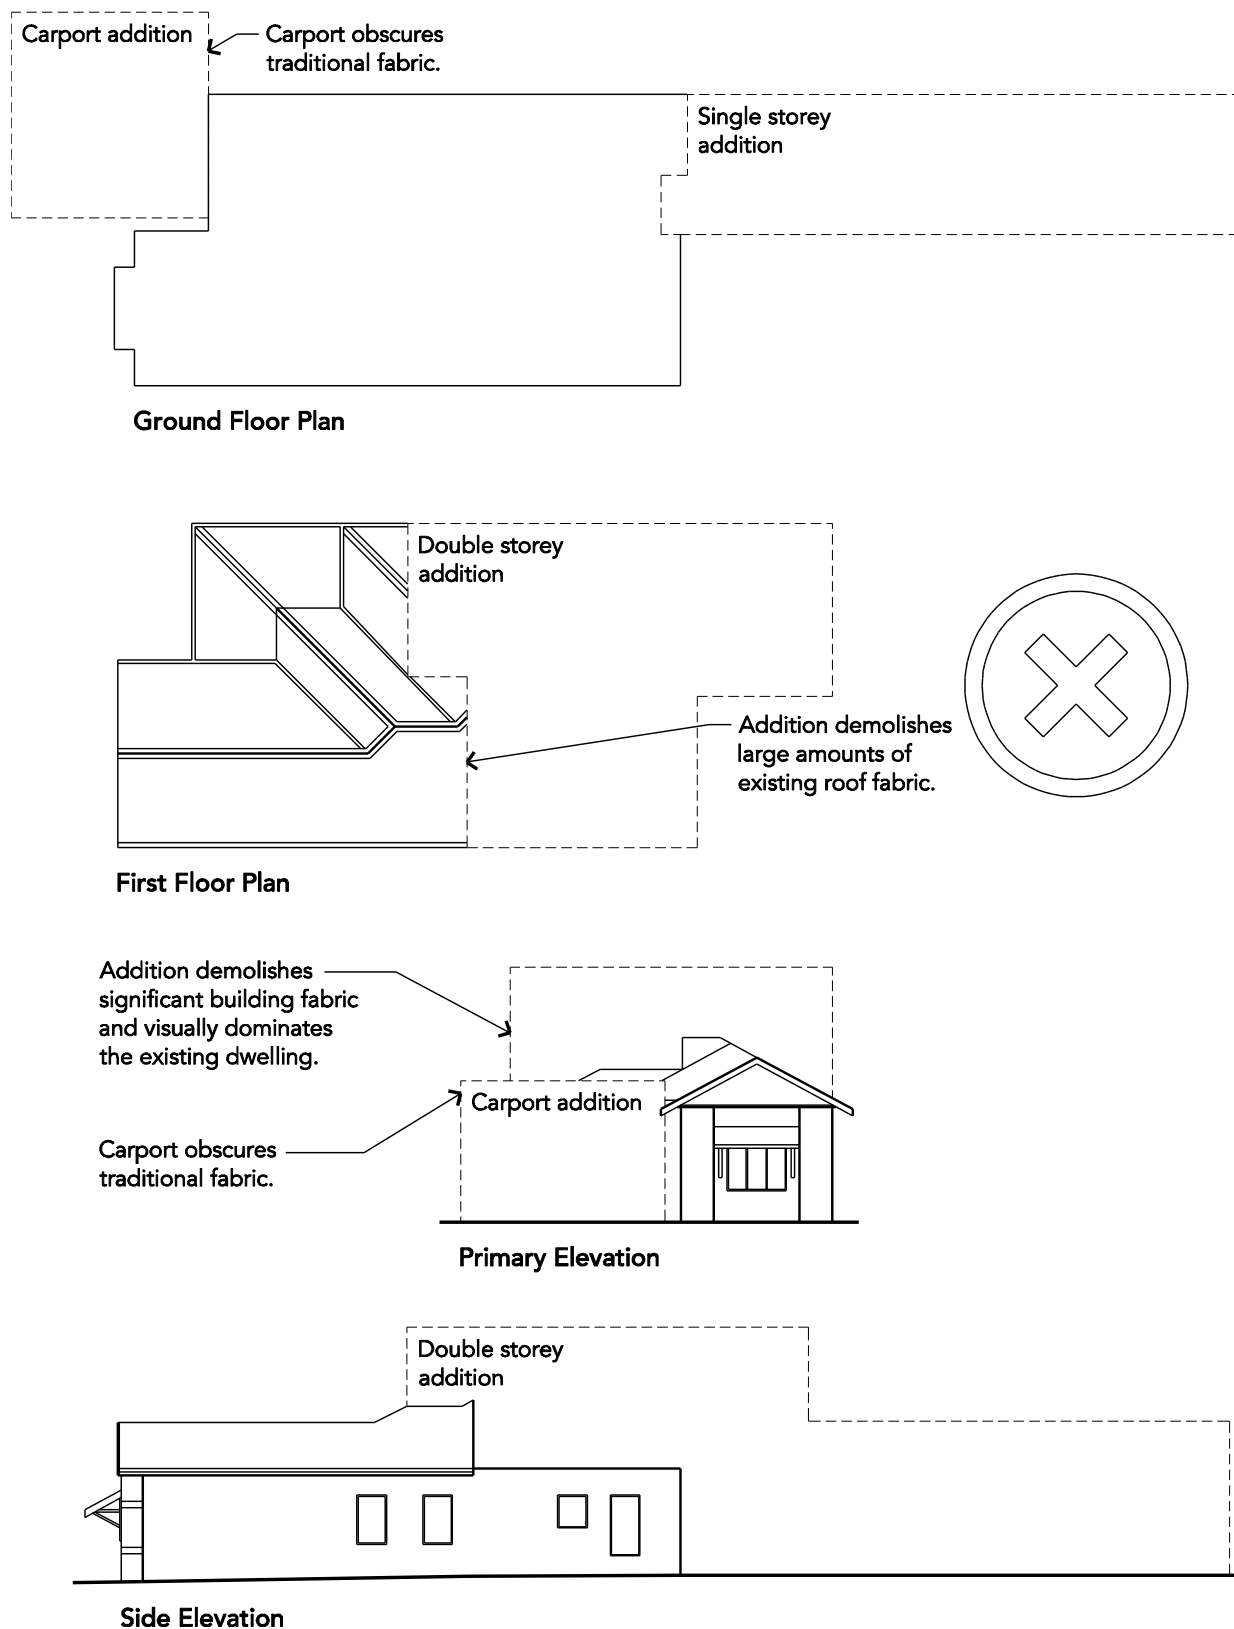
Plans and elevations illustrating incompatible alterations and additions – *Griffiths Architects 2012.
